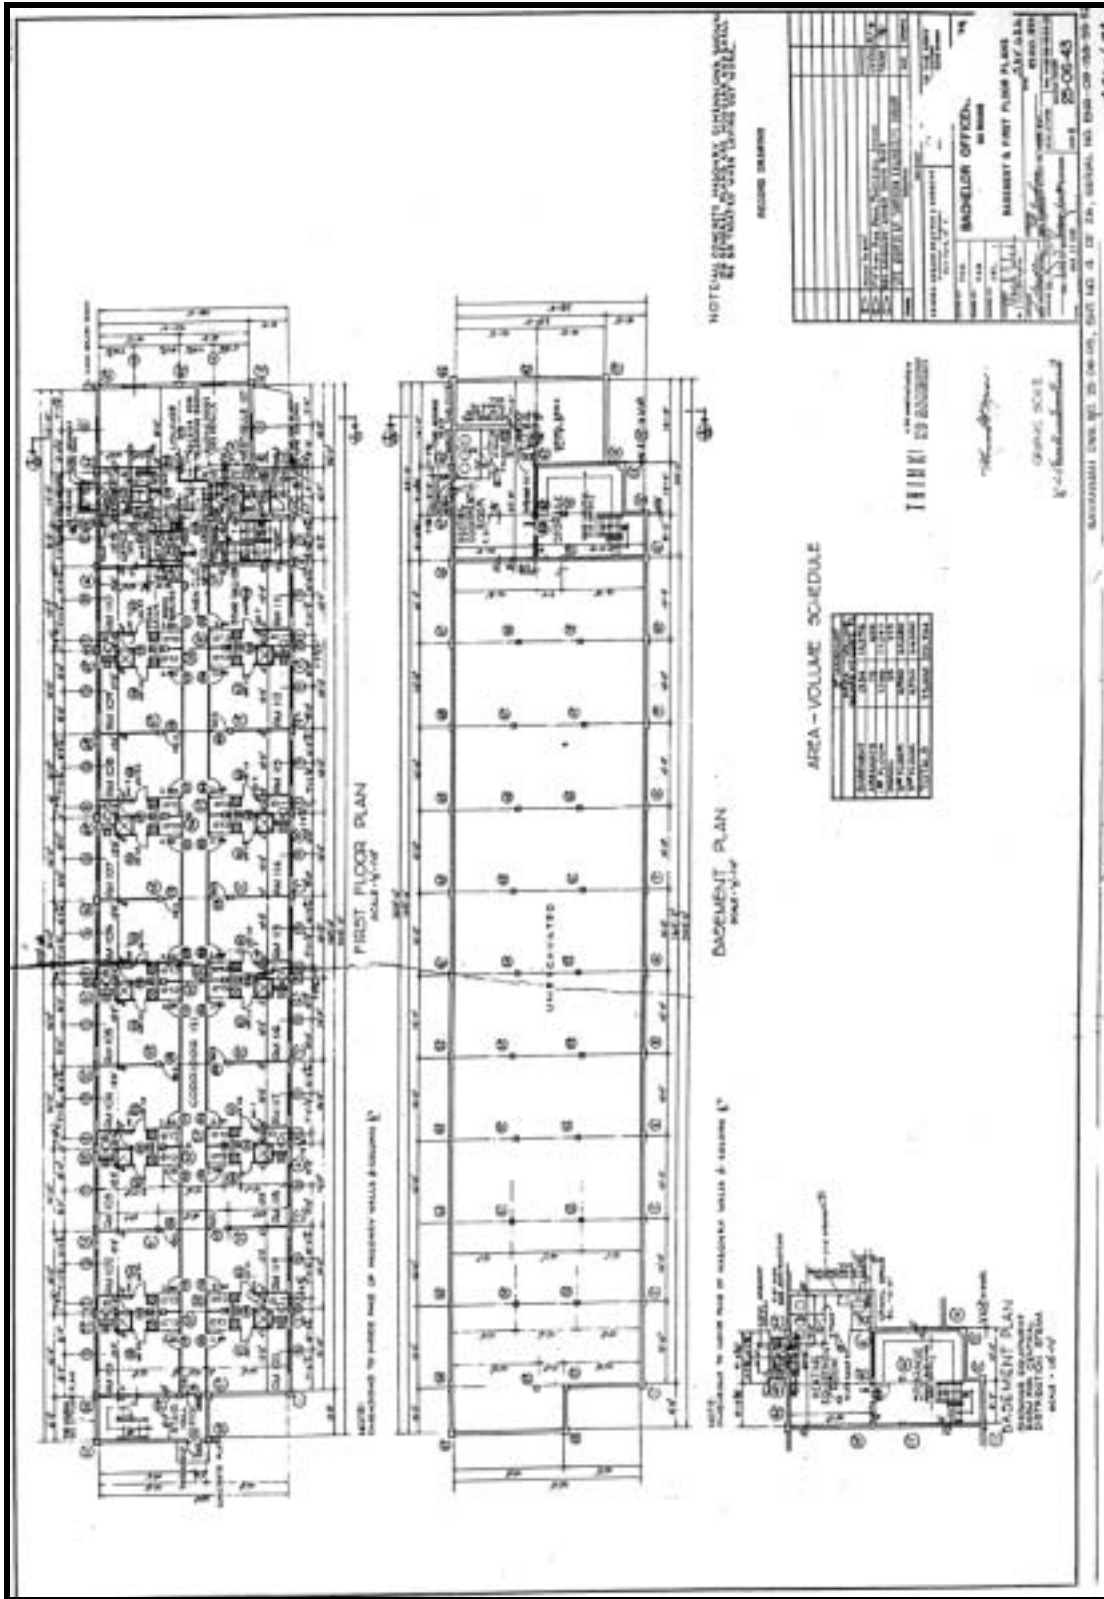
Three-story, hammerhead BOQ, basement and first floor plan, Ft. Benning (1955) (Engineering, Ft. Benning).
